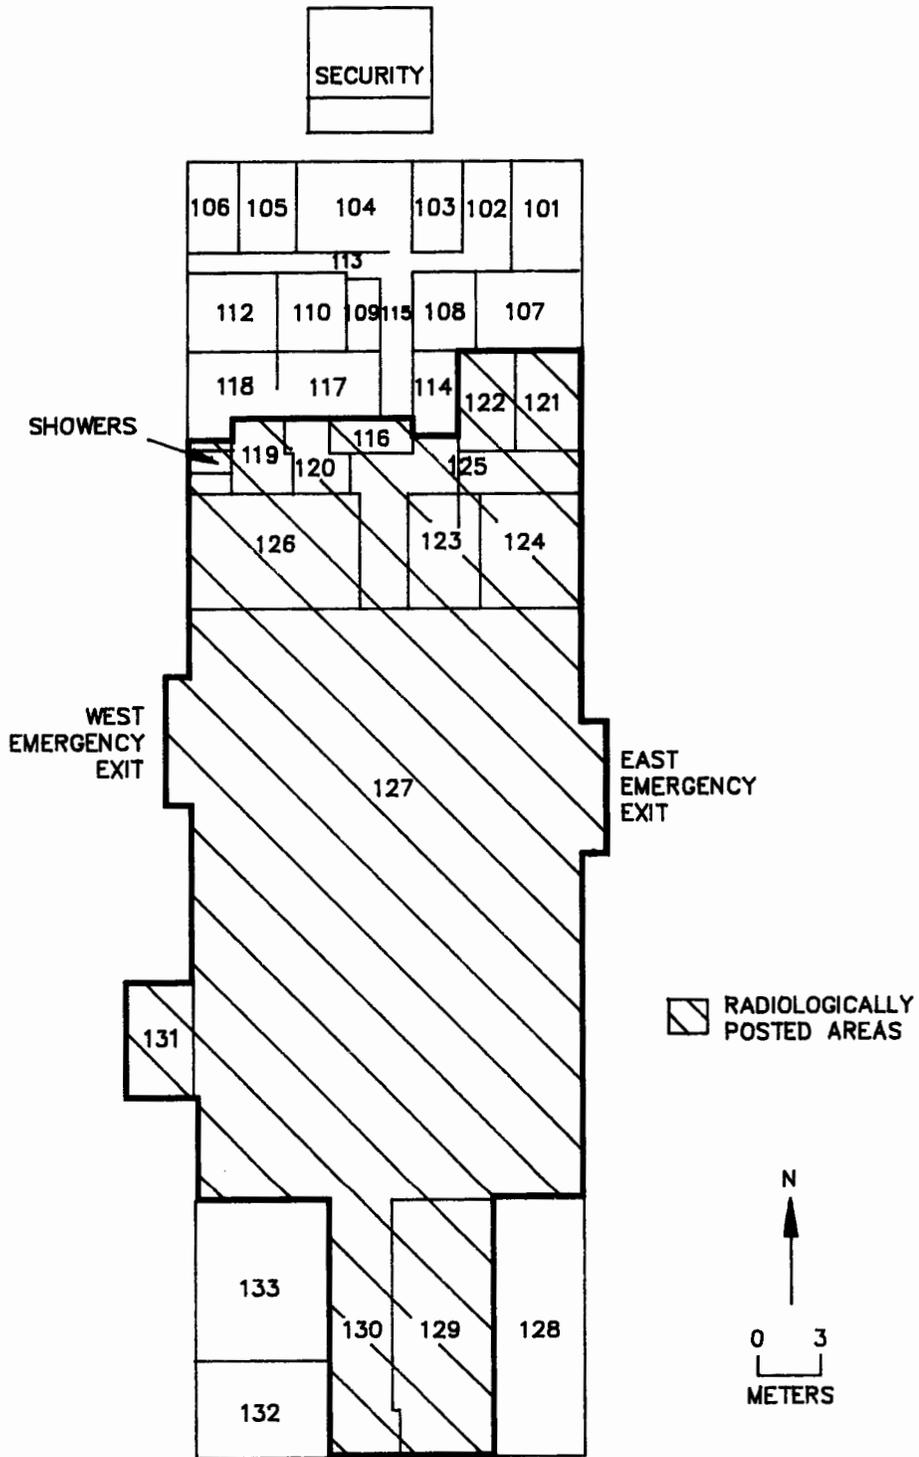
Nuclear Materials Development Laboratory (Building T-055) Floor Plan
